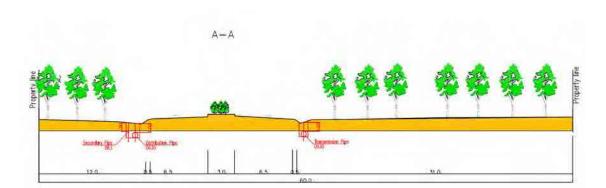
Typical Pipe Installation for Phase 1 Route (Section A-A)
